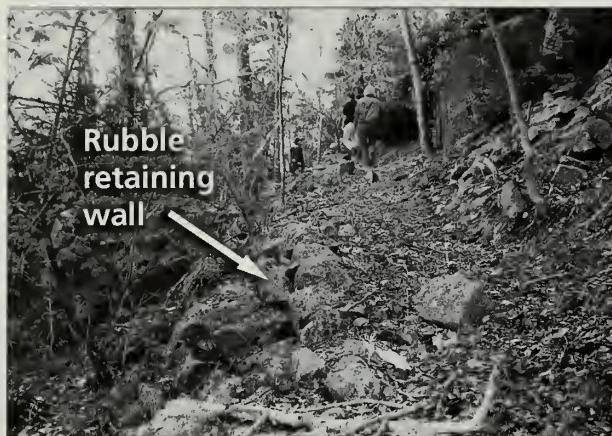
The remains of an early VIA/VIS stone rubble retaining wall on the lower Eagles Crag Trail (#343).
